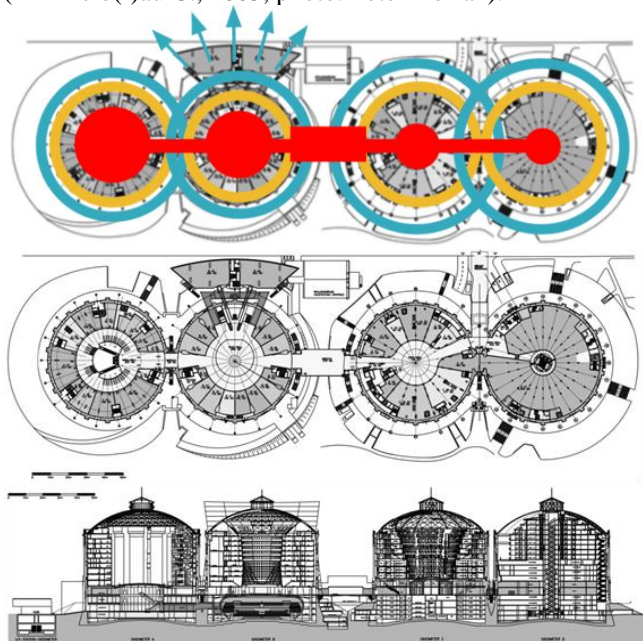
Ground floor plan and longitudinal section; plan and section drawings illustrating the spatial uses and the horizontal to vertical relationship of the Gasometer structures (www.gasometer.org, June 2005).
